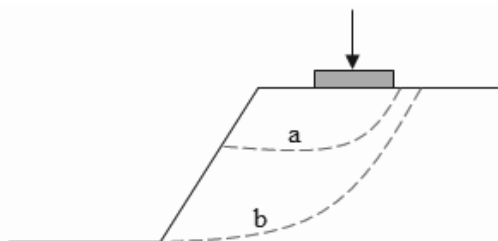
Typical failure modes for footing-on-slope system: bearing capacity mode (a) and overall slope failure (b).
